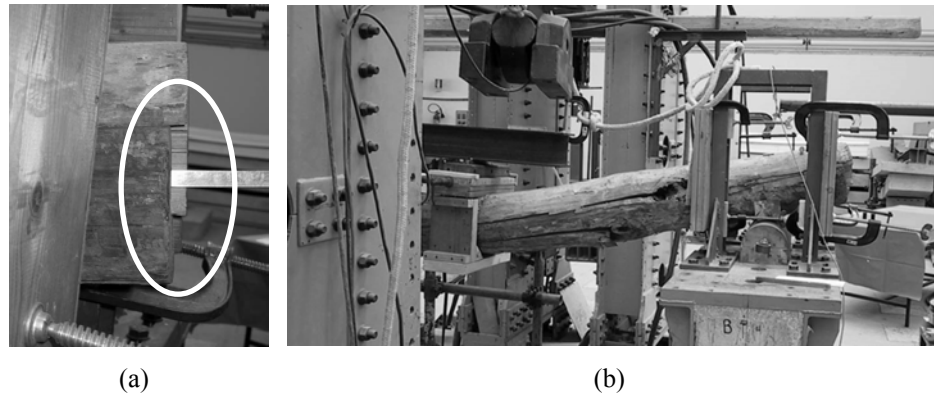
Slipping at the end section of Beam 1 (a); shear failure-type collapse mode of the tested beam (b).
